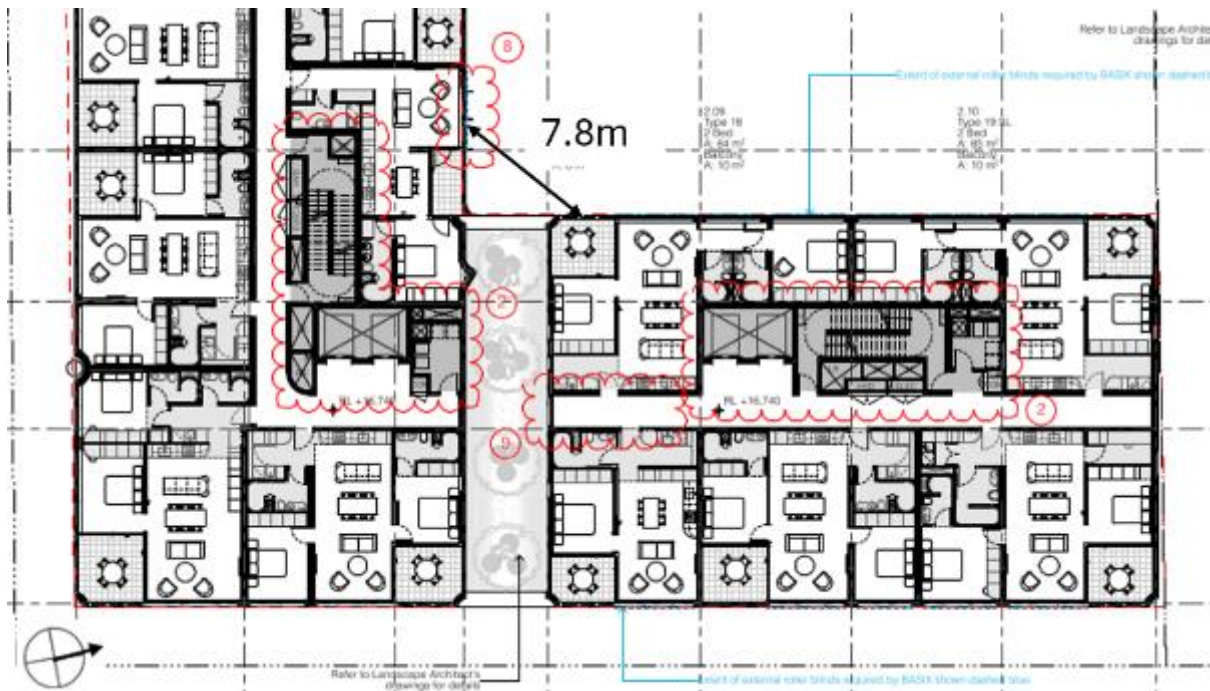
Proposed floor plan at Level 2 of Block E (similar at all levels) depicting separation between apartments within the development
